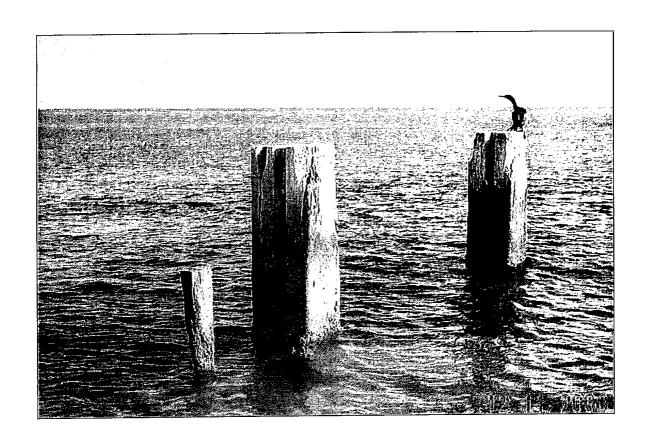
CONCRETE KING PILES (DEC 2000)
